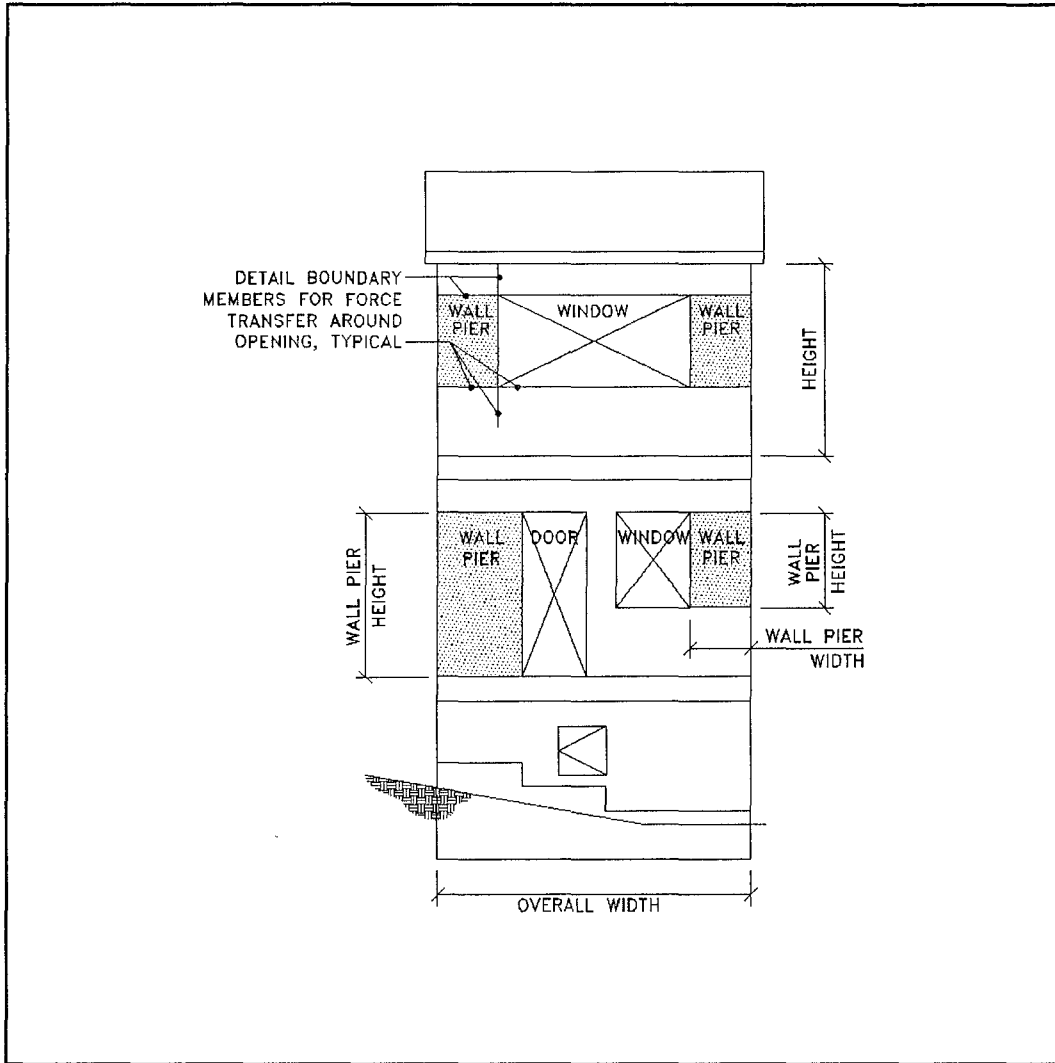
Alternate shear wall height-to-width ratio with design for force transfer around openings.
